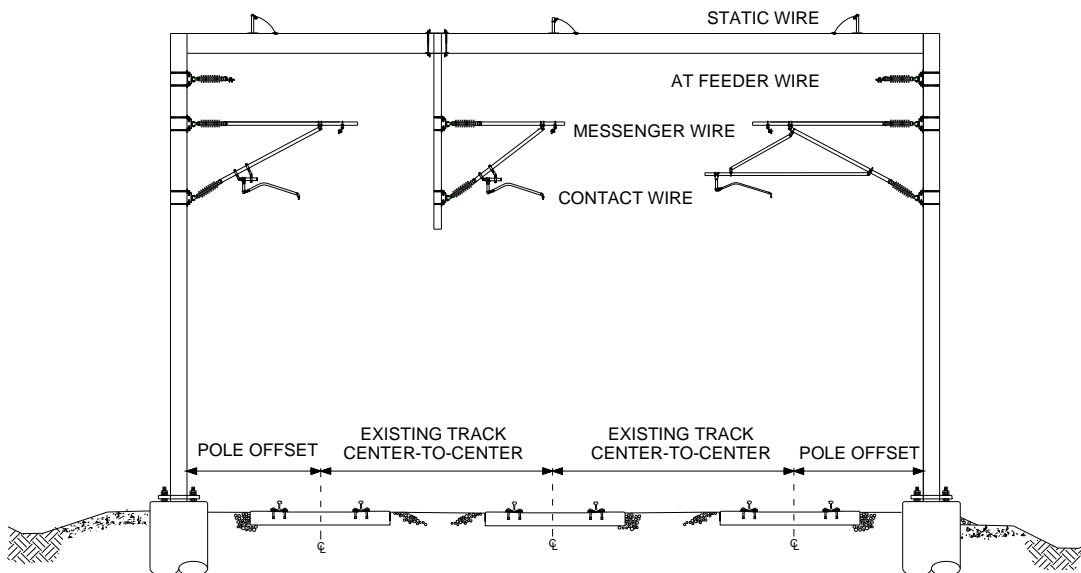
Typical Two-Track OCS Arrangement with Side Pole Construction
